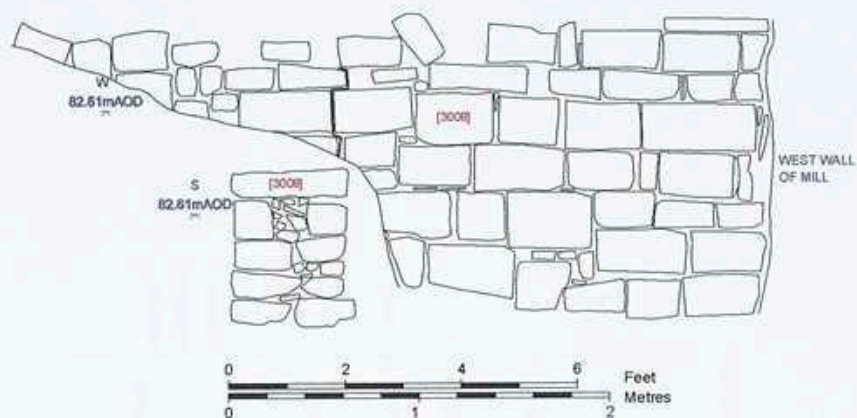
South facing elevation, and section through, the "Transverse wall". Scale (1:40).
